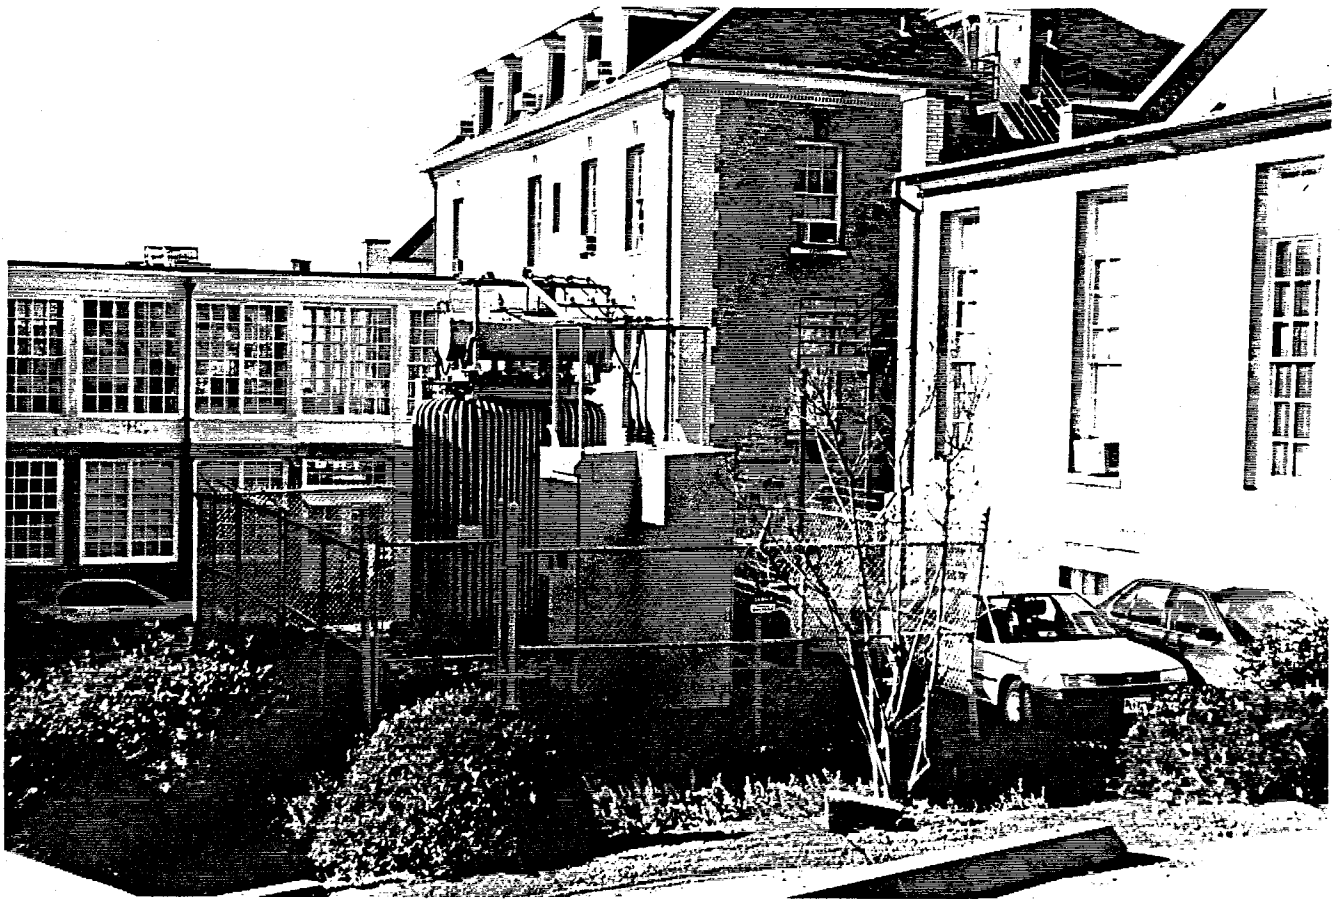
Figure FF: Site and Landscape, view of parking lot south at rear of Building 3.
